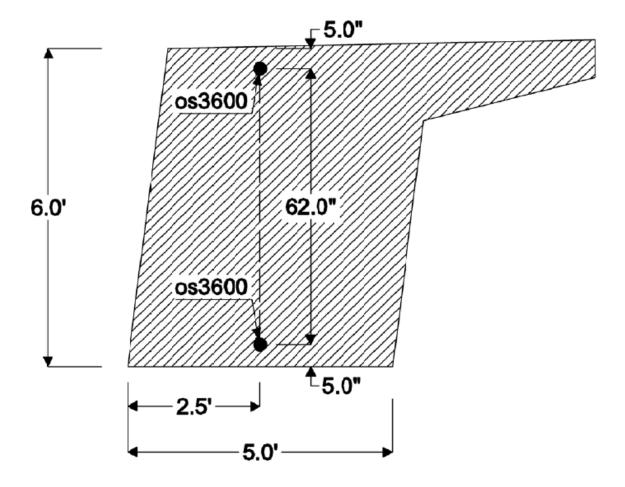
Cross-section of edge girder showing location of strain sensors
